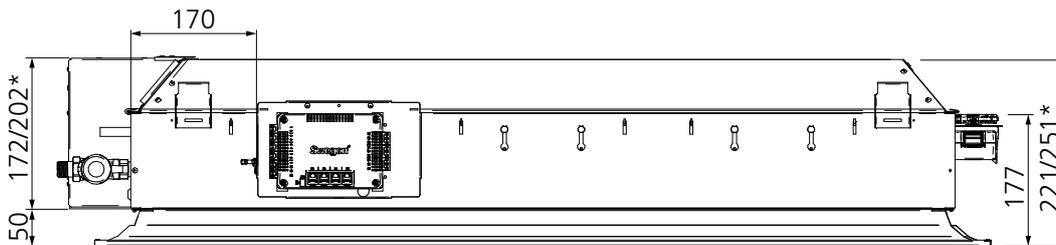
Dimensional drawing, side view. Air connection on the short side.
